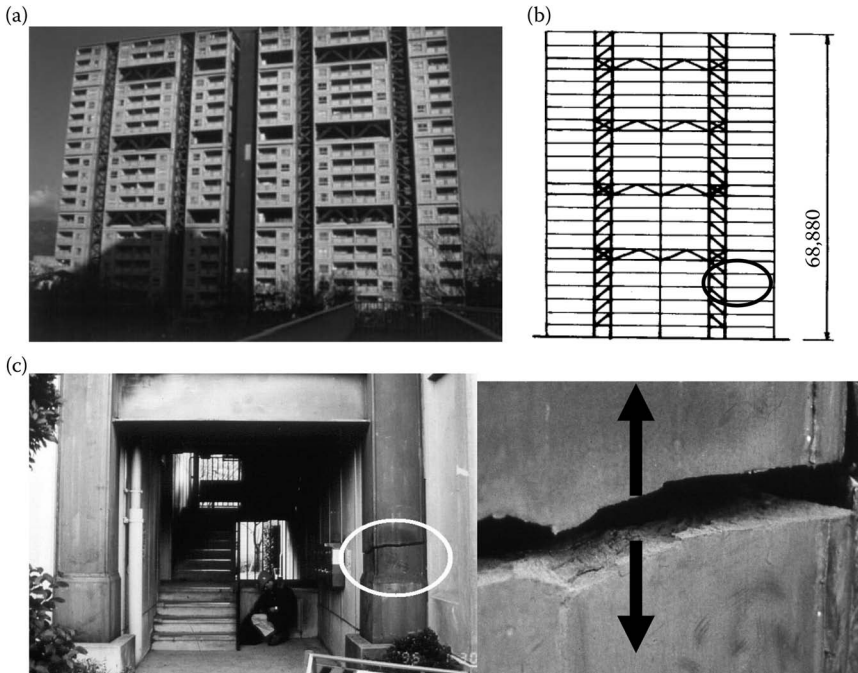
Column fracture for Ashiyahama apartment buildings: (a) building view; (b) building structure; (c) column fractures.
